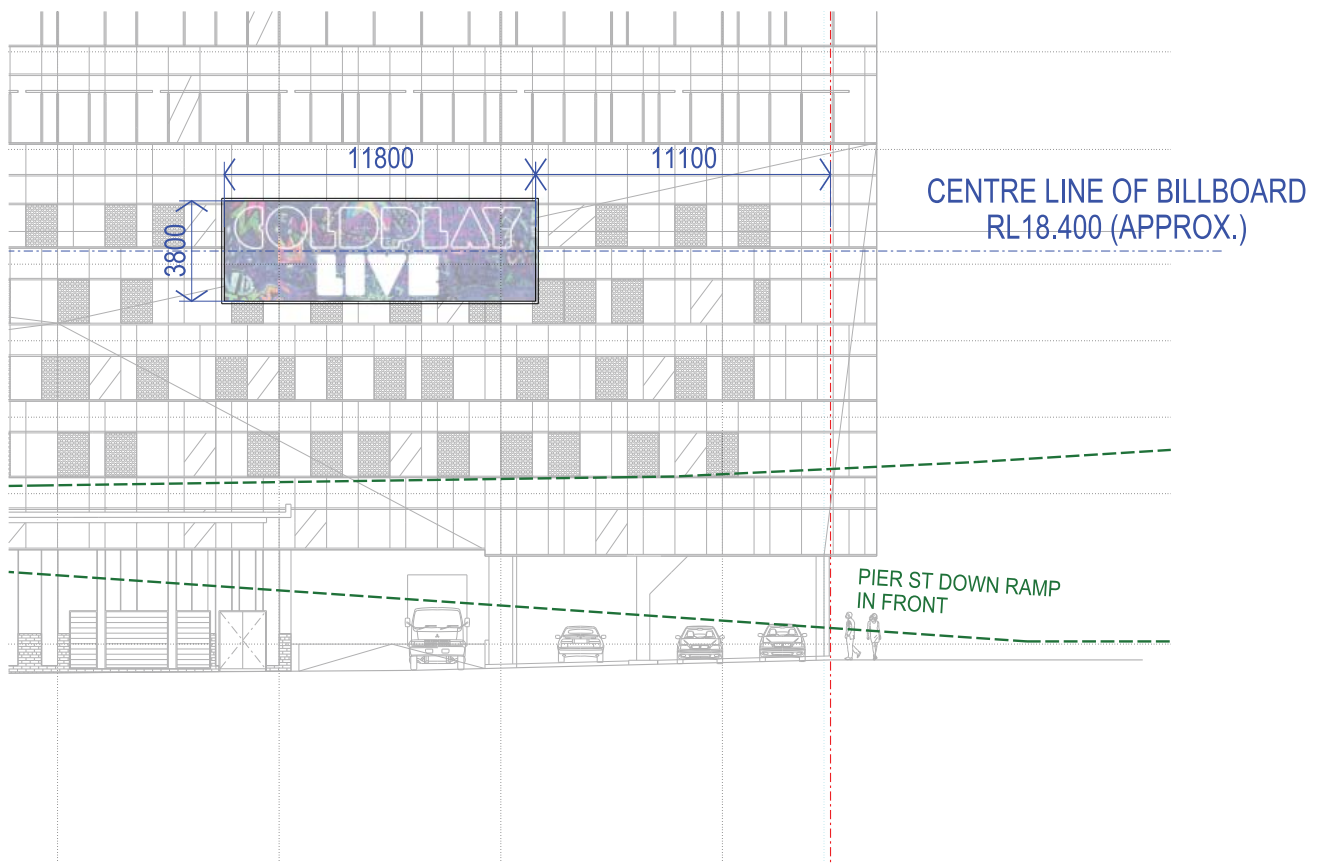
Elevation - Detail of Wall advertisement, Lend Lease Design
